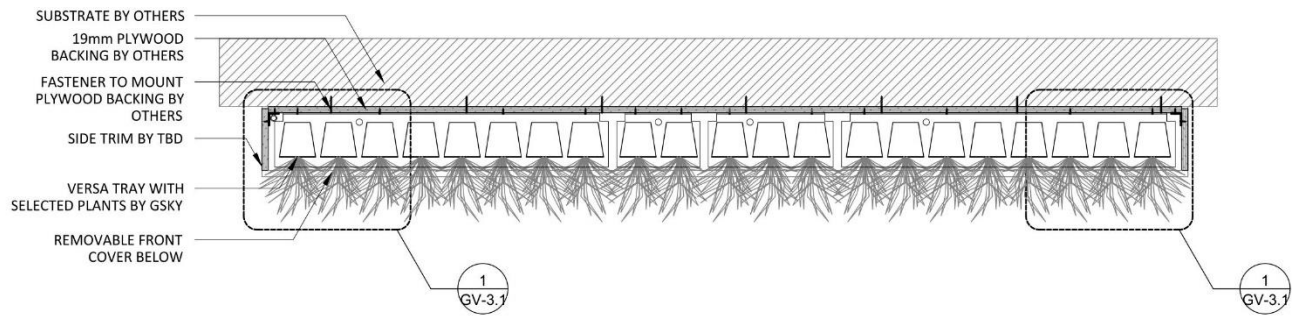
Versa Wall Above the Floor/ICU Below Wall VTI-70 Plan. Versa Wall CAD & Specs. (2020, March 2). Retrieved from <https://gsky.com/versa/cad-specs/>
